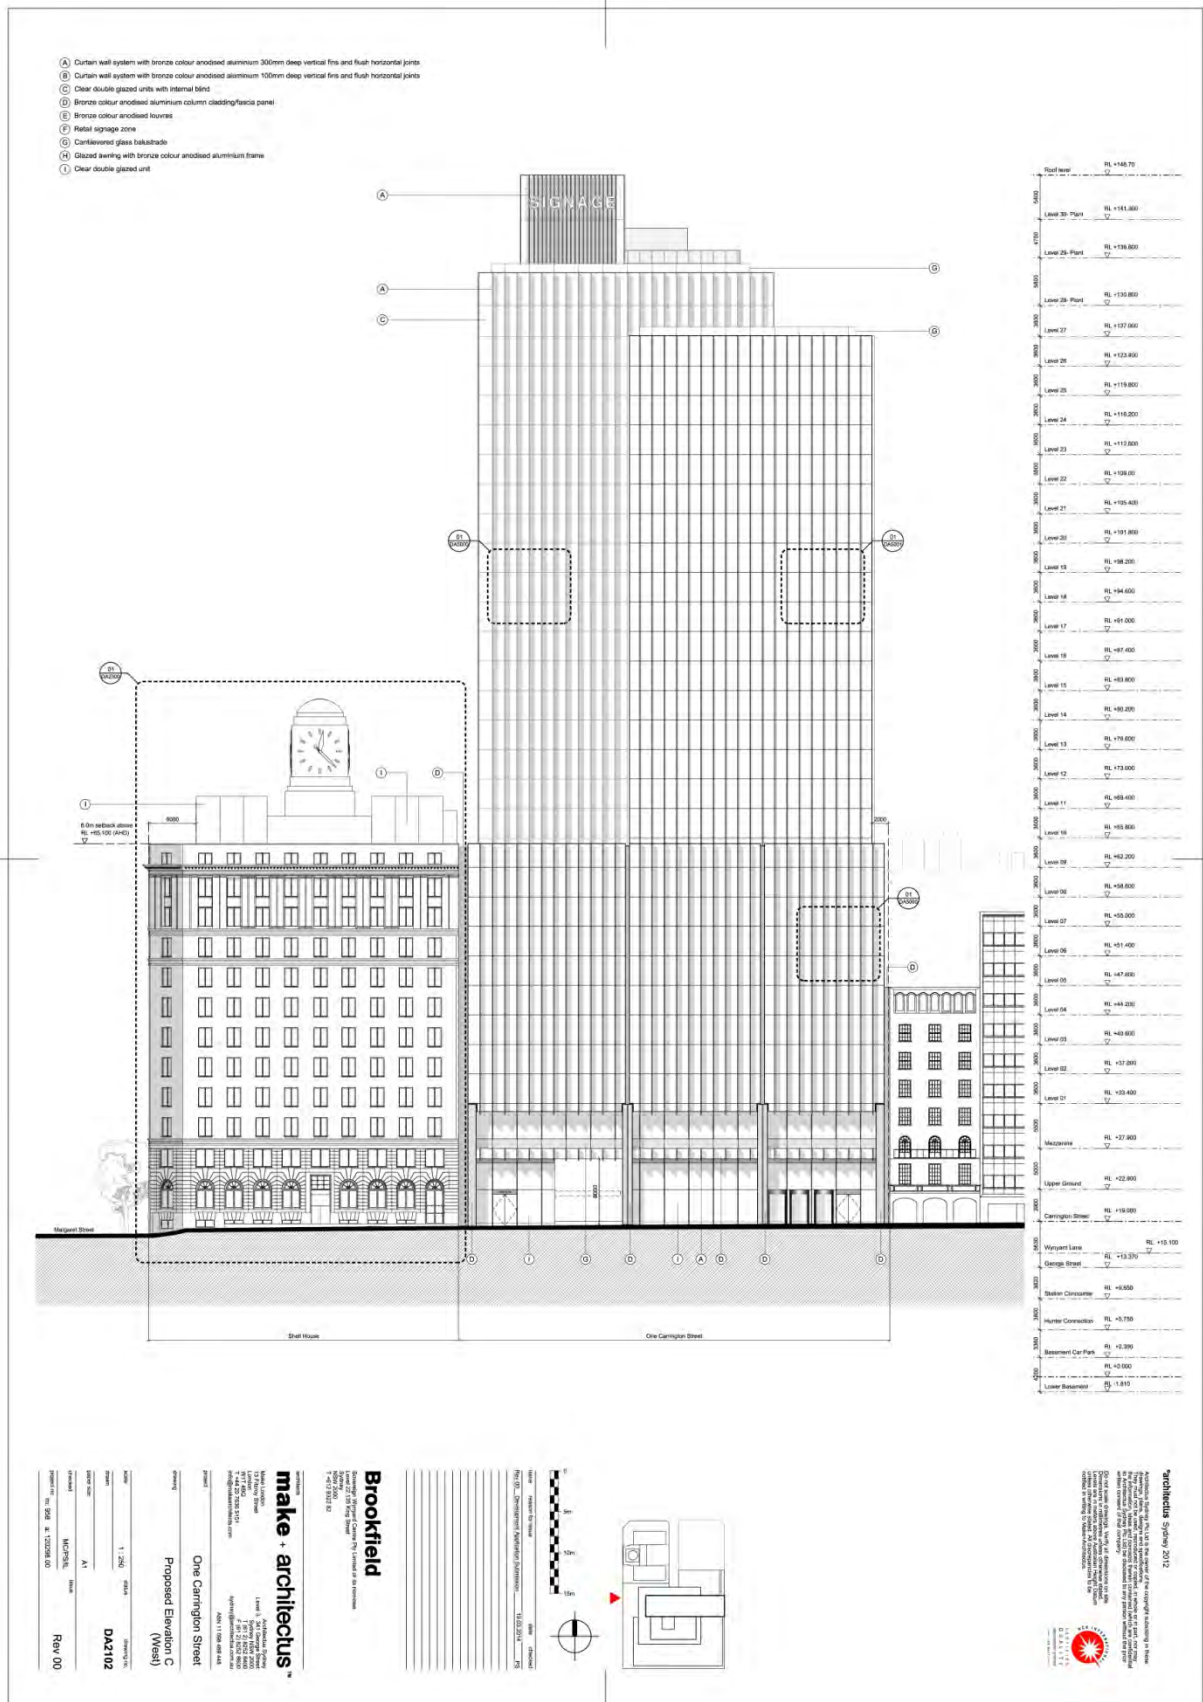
Carrington Street elevation showing the relationship of the proposed One Carrington Street development podium with the former Shell House and Lisgar House. (Source: Make Architects/Architectus)
